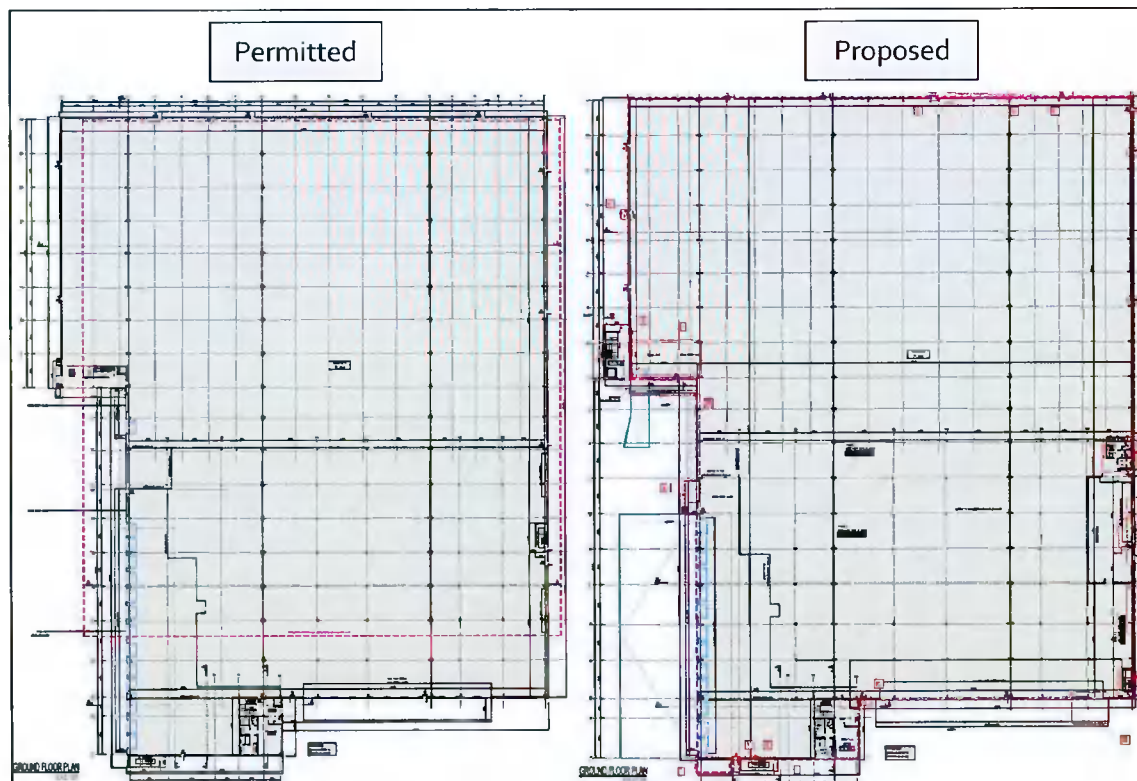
Permitted (SD21A/0200) and Proposed Ground Floor Plans
